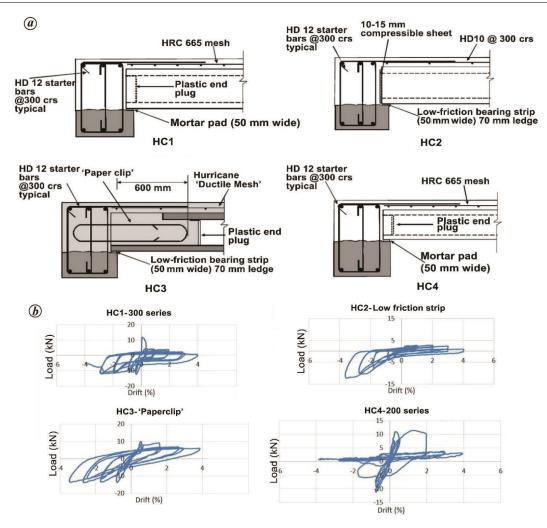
Details of sub-assemblage⁴⁶: a, Connection details; b, Hysteresis performance of the tested connection.
